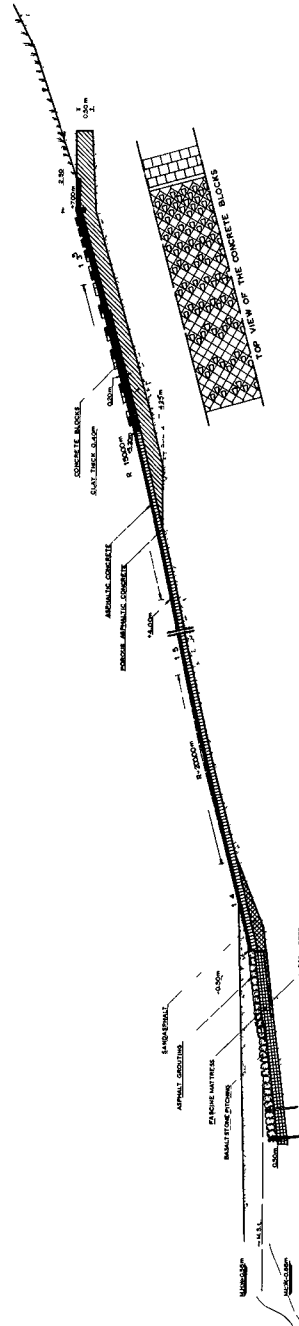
ASPHALT REVETMENT WITH BEAVERHEAD CONCRETE BLOCKS (EYERLAND, TEXEL)
